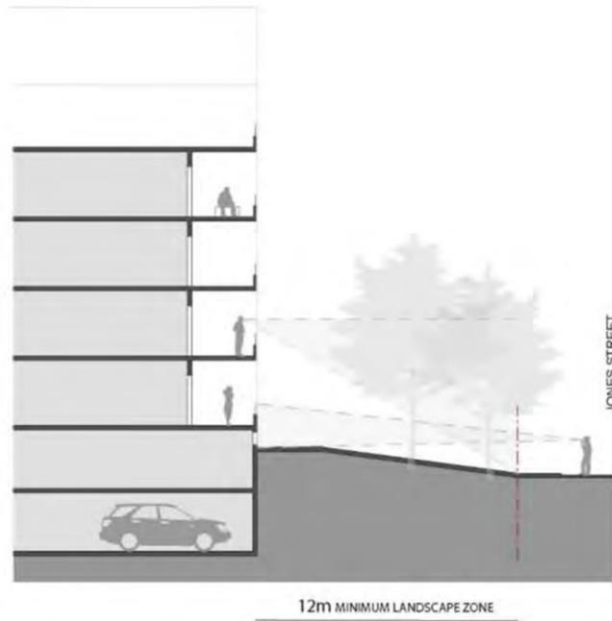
Indicative section at precinct eastern boundary, adjoining Jones Street
